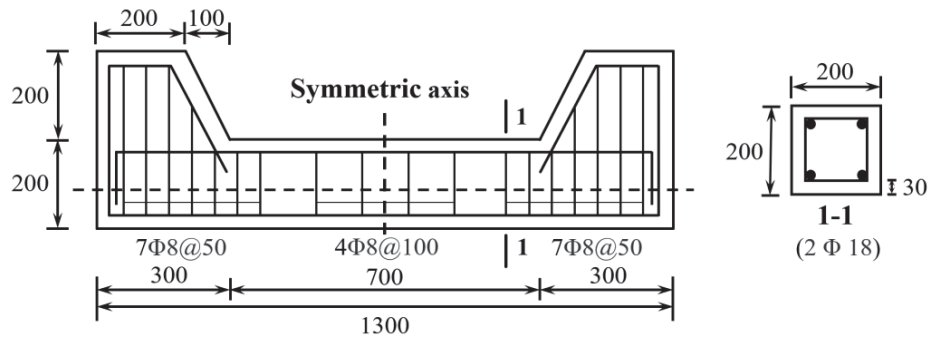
Design details of the corroded RC columns tested by Wang and Liang (2008)
